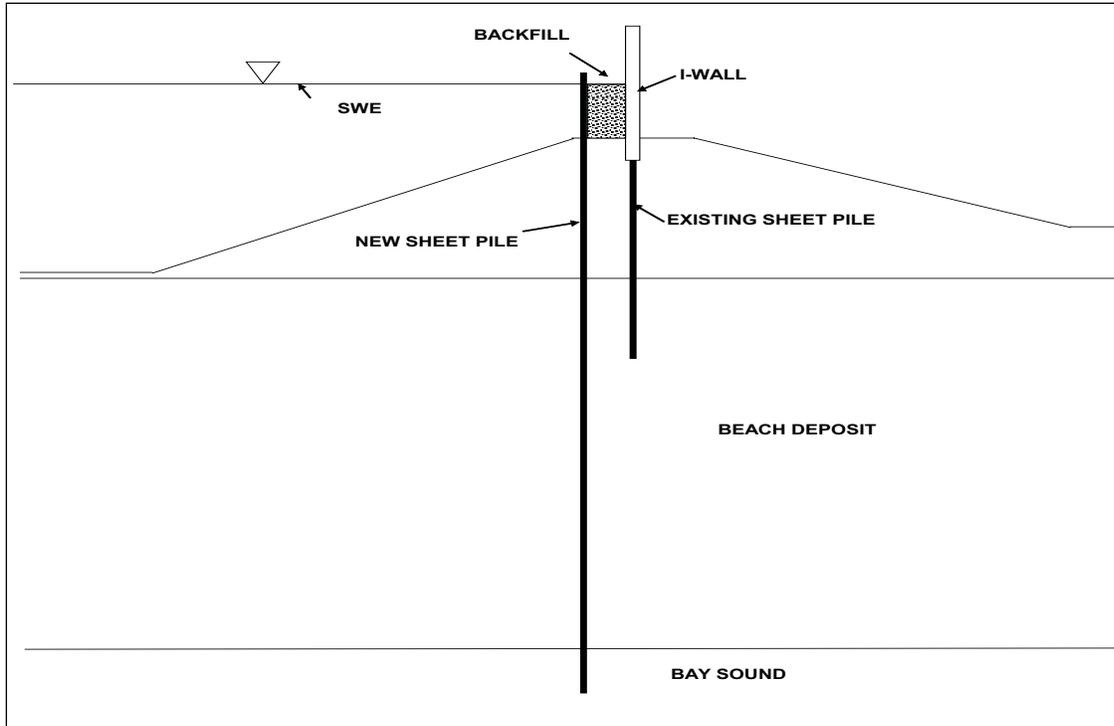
Conceptual drawing of flood side sheet pile cutoff wall
